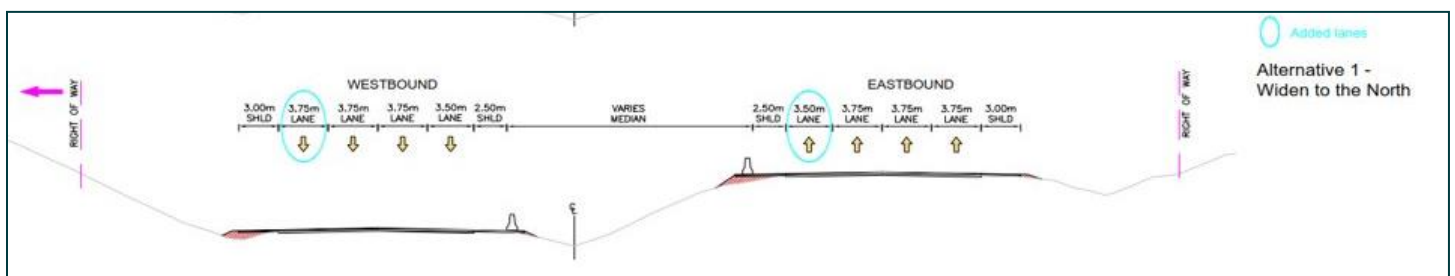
Cross Section for the Preferred Alternative for Section 2 – Extend Fully to the North (8-Lane)
